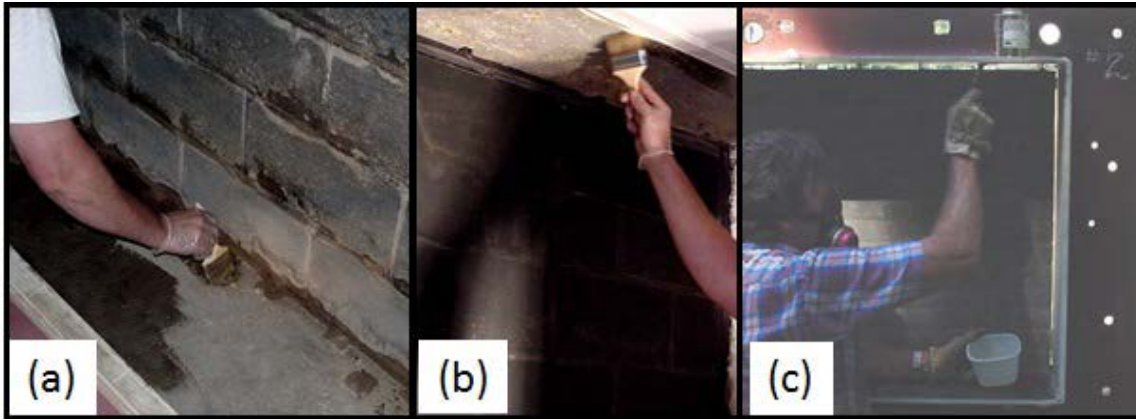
Primer application. (a) Primer 1 applied to steel plate on bottom support. (b) Primer 4 applied to concrete top support. (c) Primer 2 applied to subscale steel frame.
